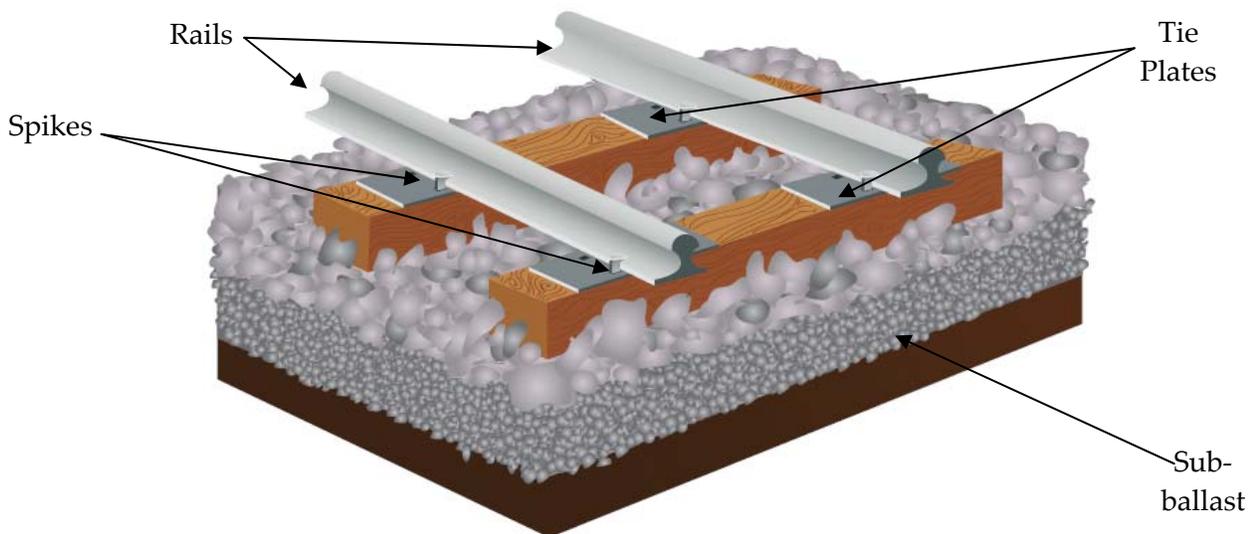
Schematic of Railroad Tie Installation with Rails, Tie Plates, Ties, and Ballast Shown
